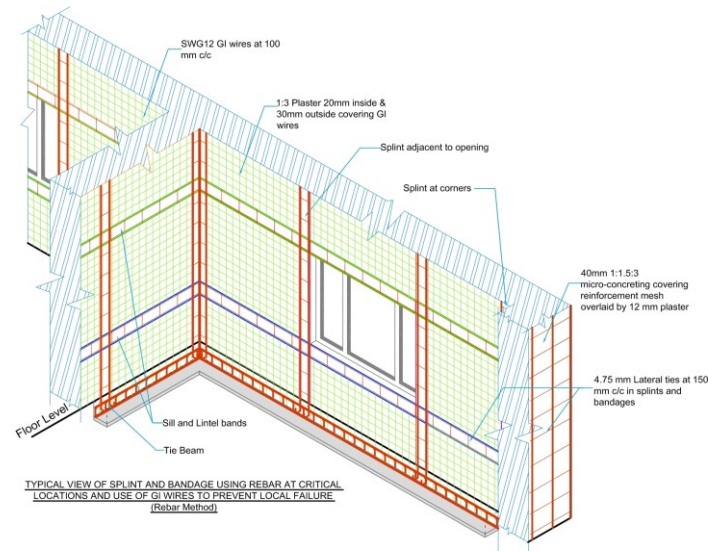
Typical design output of retrofitting for stone masonry wall using Rebar Method (© NSET, 2015)
